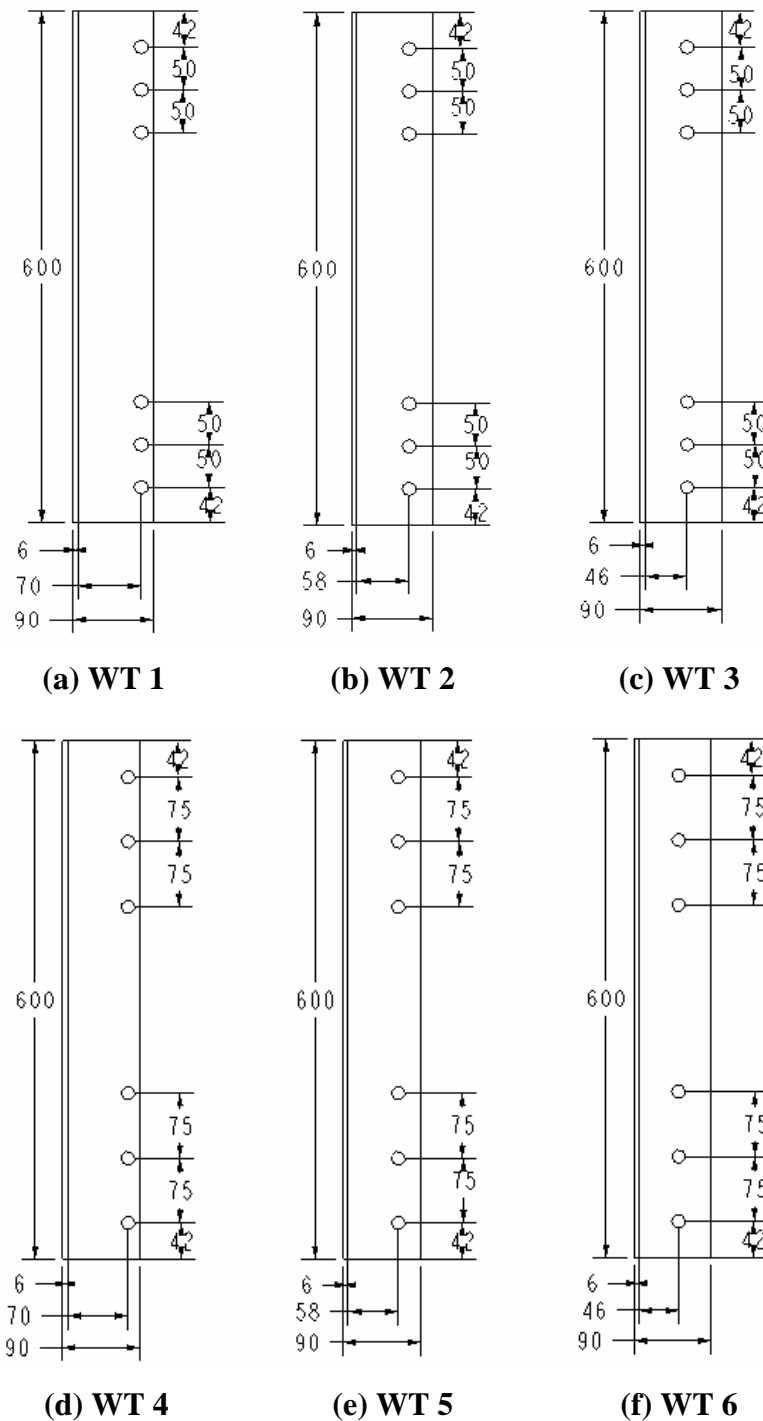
WT 90x2, 3 bolt connection specimen geometry (Rolled steel, 4 mm thick web, bolt holes are 16 mm in diameter)
